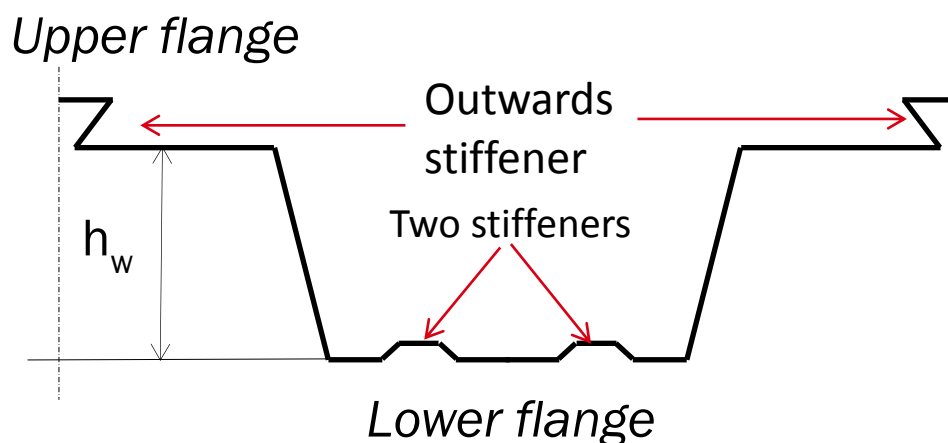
Steel sheeting with outwards stiffener in the upper flange and with two stiffeners in the lower flange
